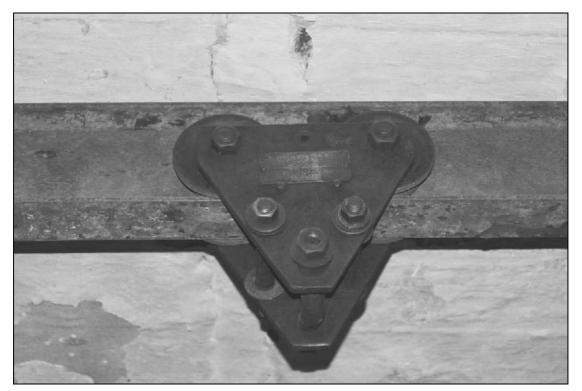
Detail of inserted hoist, G6, north range (film 42.23)
